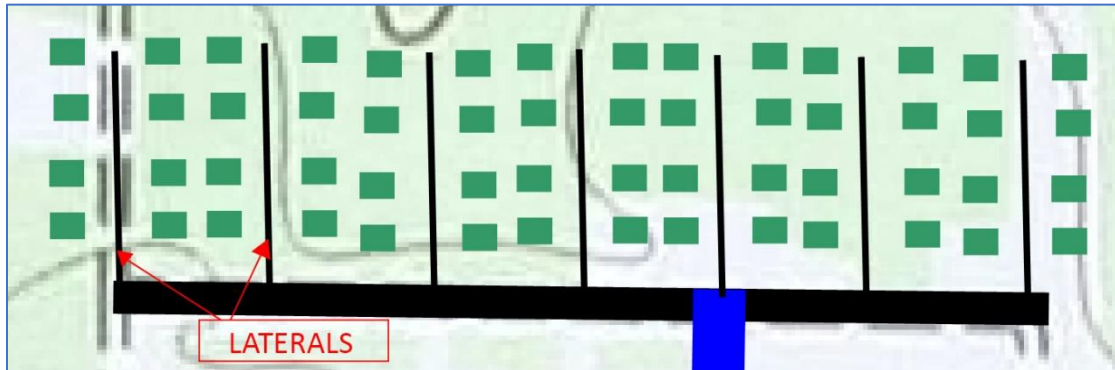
Proposed Subdivision Streets and Houses on the North Portion of Area-1.
